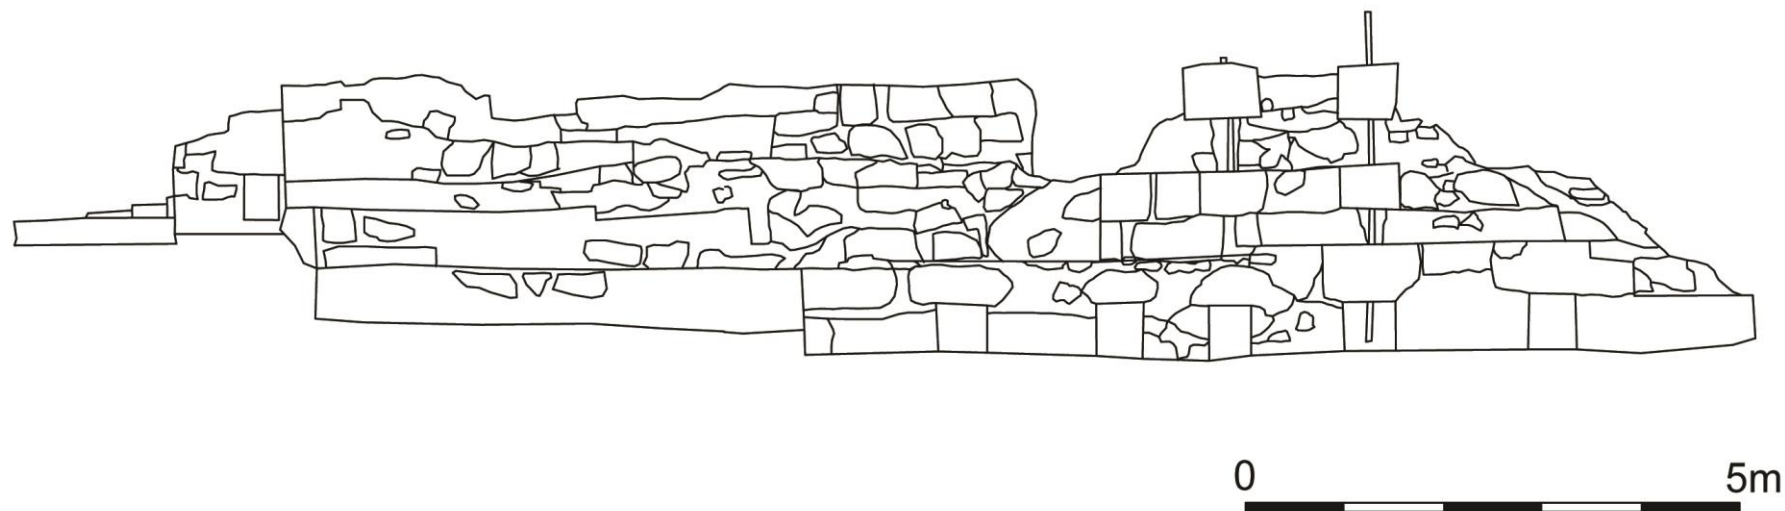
Section drawing using photogrammetry of west elevation of man-engine house.
